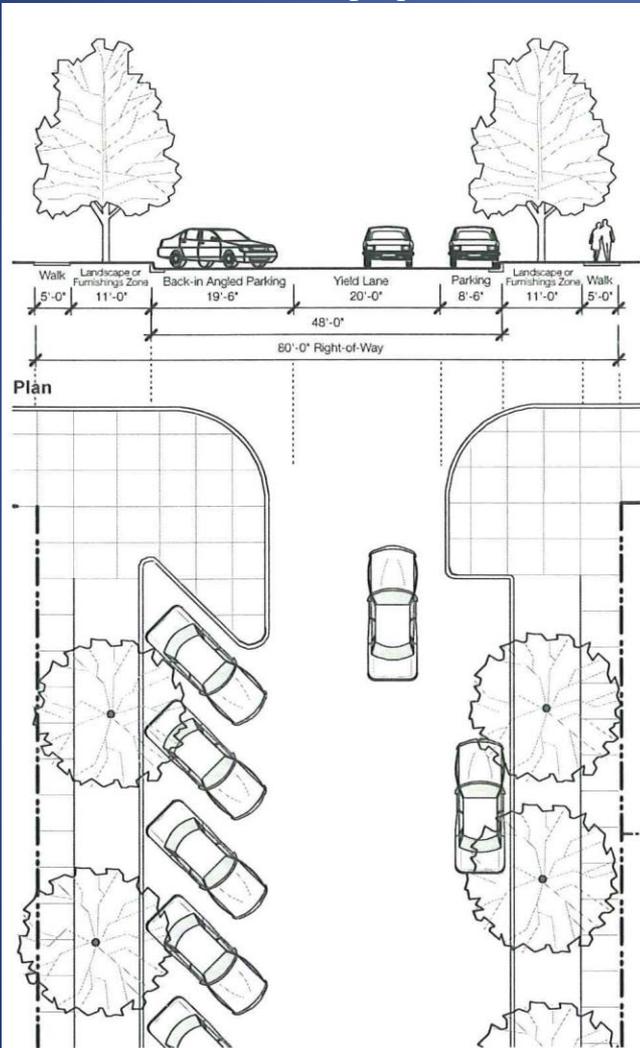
(h)-1: Typical Sample Neighborhood Street.
